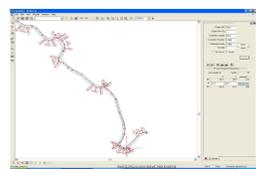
Plan window in Location module, RoadEng® (Enache, 2009)
